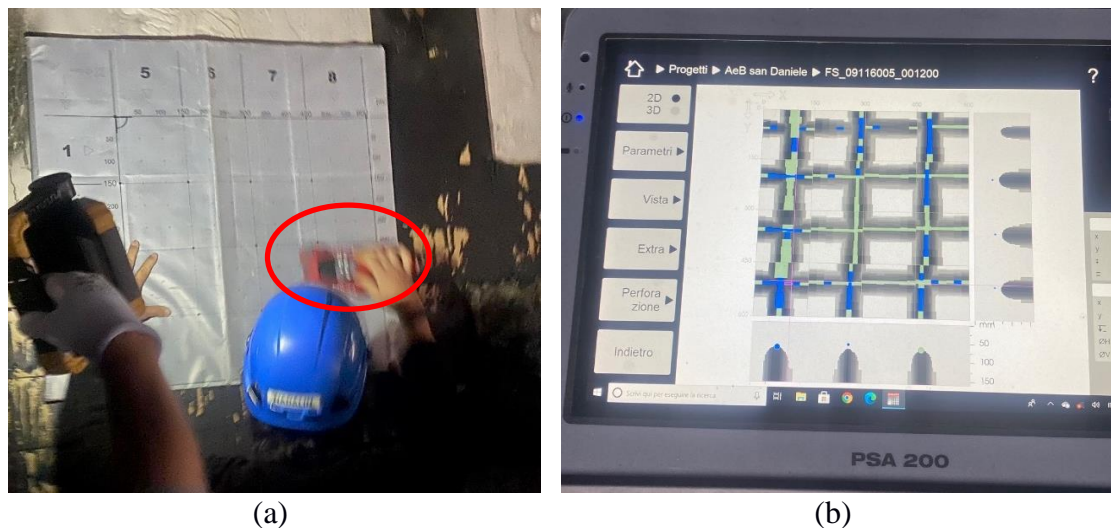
(a) Instrument on the surface to test and (b) arrangement of reinforcement.
